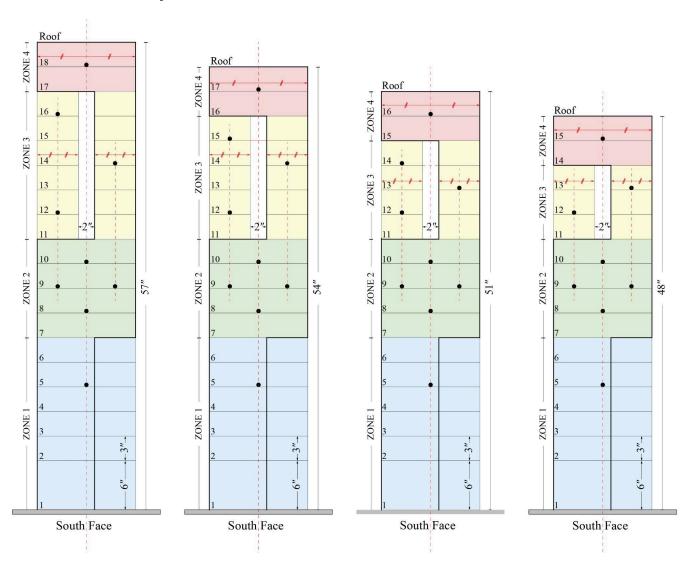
Illustration of building zones in the structural model for f = 15, 16, 17, and 18. Refer to Figure 1 for notation used in elevation views. Black-filled circles represent the location of dead loads for shake-table testing. Note that only the North/South faces are shown. East/West faces are symmetrical.
